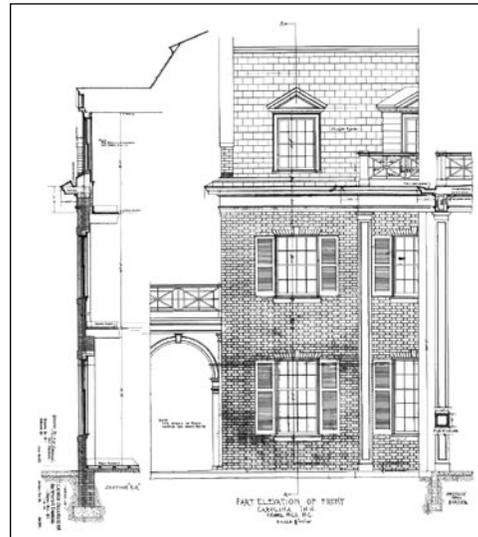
Partial elevation drawing of the Carolina Inn (as designed), 1924, Arthur Nash, Architect (UNC Facilities Planning and Construction Plan Room).
